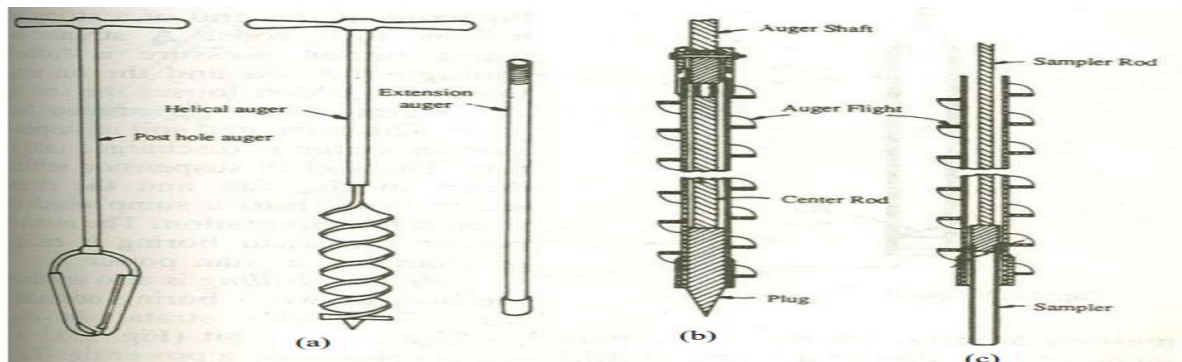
Augers (a) Hand Augers (b) Hollow-stem auger plugged while advancing the auger (c) Hollow-stem auger plug removed and sampler inserted to sample soil below auger
